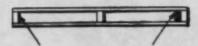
Arrows point to reinforcing stringers nailed on inside of original stringers damaged by rough use.
